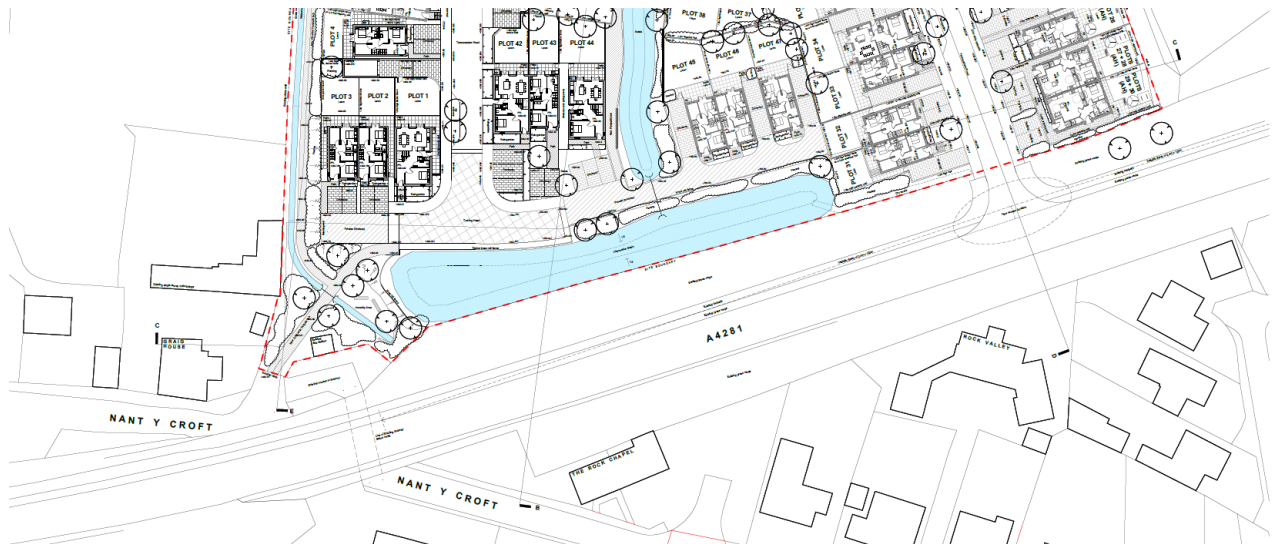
positioning of the development relative to dwellings along Rassau Road to the south and Graig House to the south-west.
